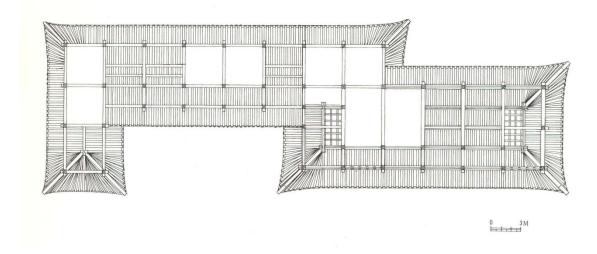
Anchae, Sarangchae Ceiling Plan (N. Zu 2003)
